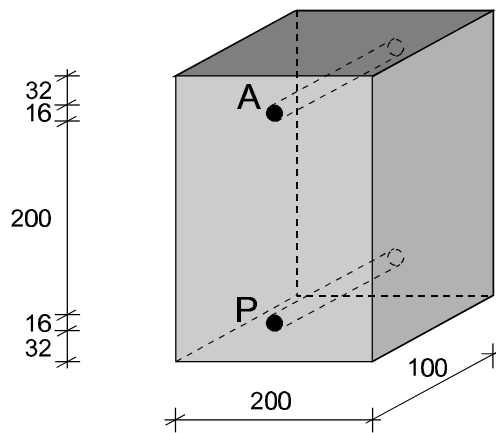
Cross section of macrocell specimen with planparallel rebar arrangement
